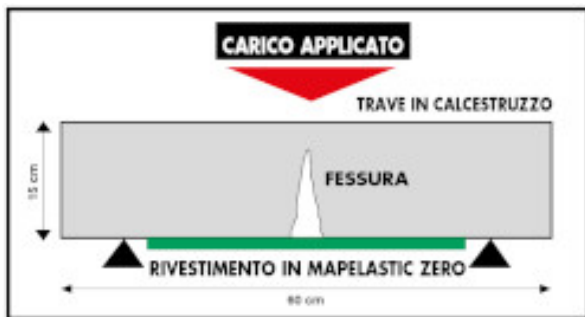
Protection with Mapelastic Zero of a crack at the underside of a concrete beam subjected to a flexural stress
